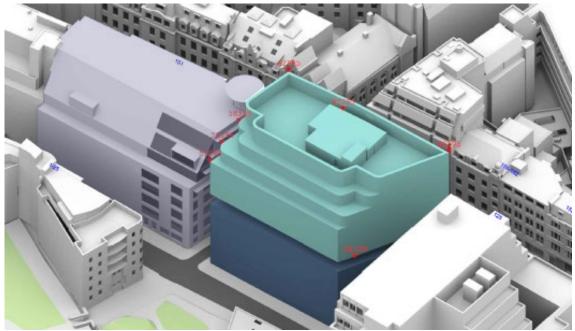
Massing model of proposed roof extension (coloured green) to Saville Theatre (planning application reference 2024/0993/P). Image reproduced from Point 2 Surveyors' daylight and sunlight report. The existing building on the Site at 151 Shaftesbury Avenue is tinted blue-grey.
